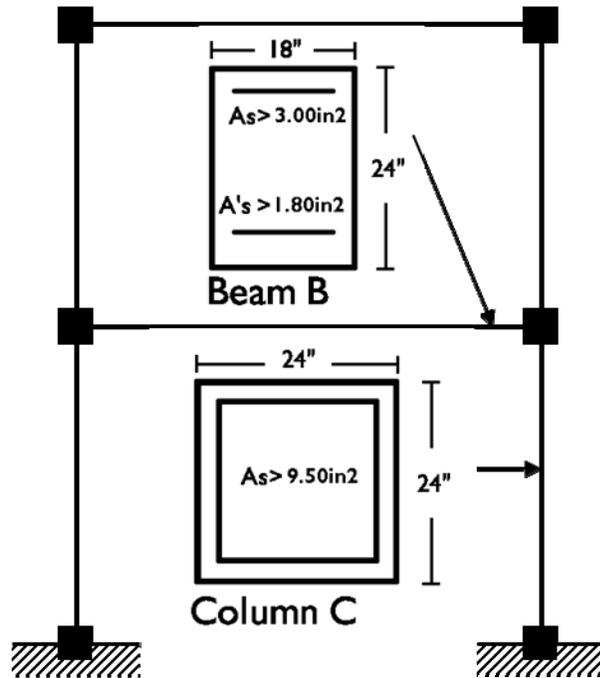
Canonical Example of Reinforced Concrete Frame with Beam B and Column C (Figure 3 in Parrish et al. 2007)
